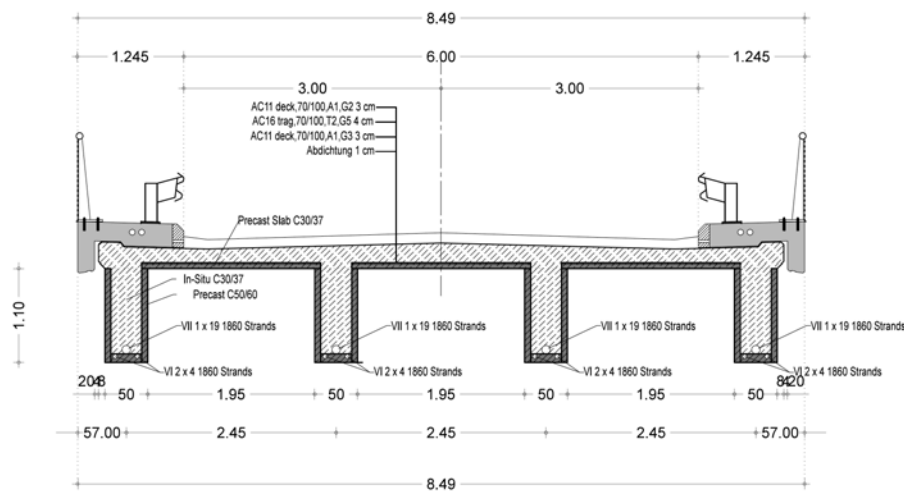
Reinforced Concrete Integral Bridge Cross-Section.
